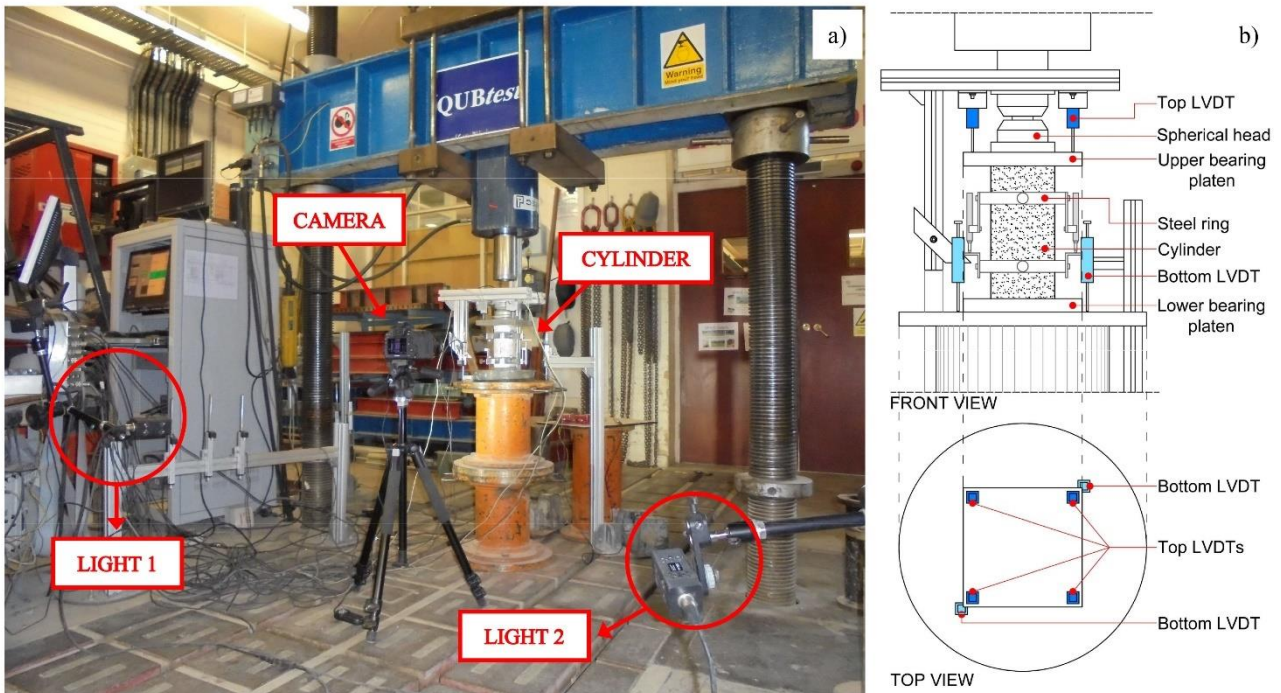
Compressive tests on masonry cylinders: a) overall setup; b) setup scheme
